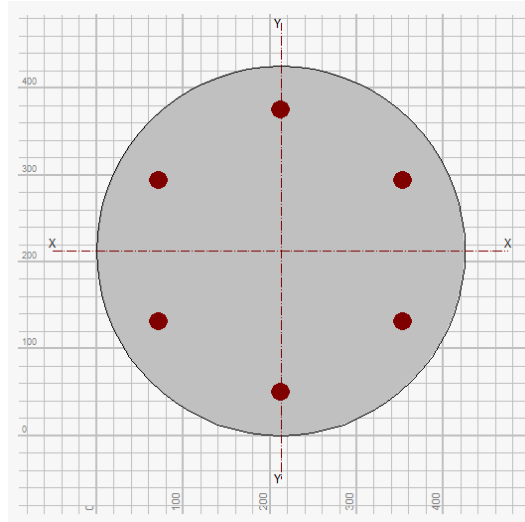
TYPICAL CROSS SECTION IN CIRCULAR COLUMN DESIGN
